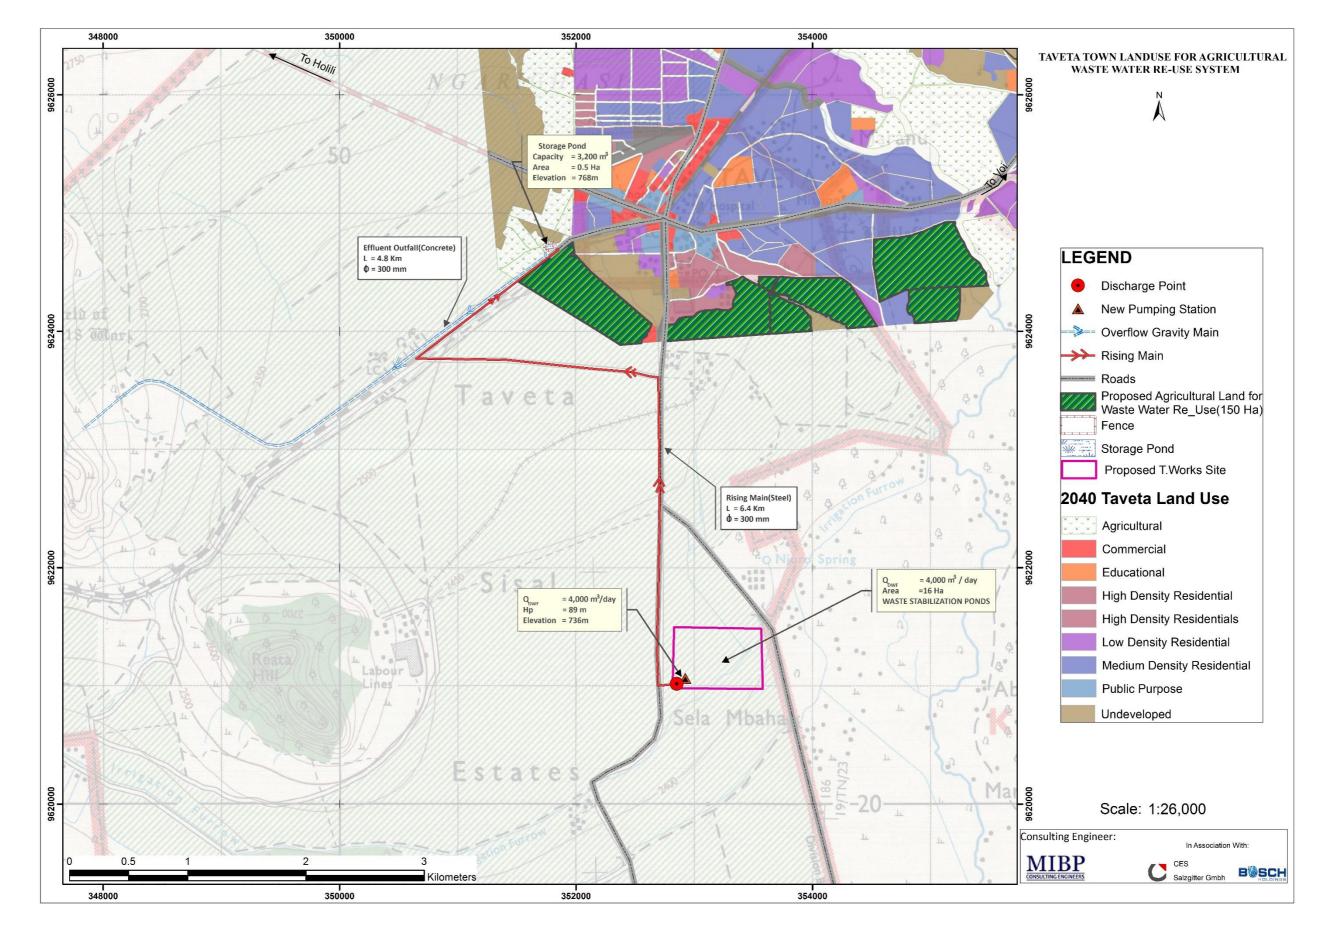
Layout Plan of the Conveyance and Storage System for Agricultural Wastewater Reuse – Taveta
